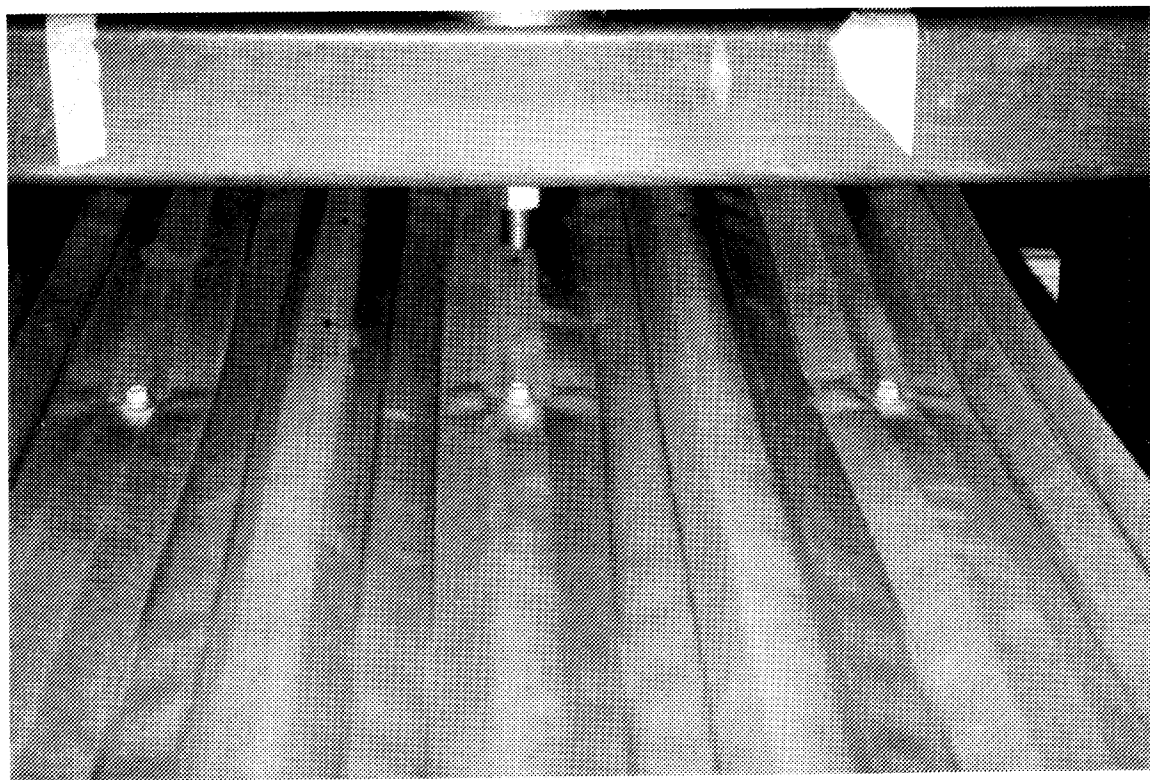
LARGE CROSS-SECTIONAL DISTORTION OF TRAPEZOIDAL ROOFING SHEET
